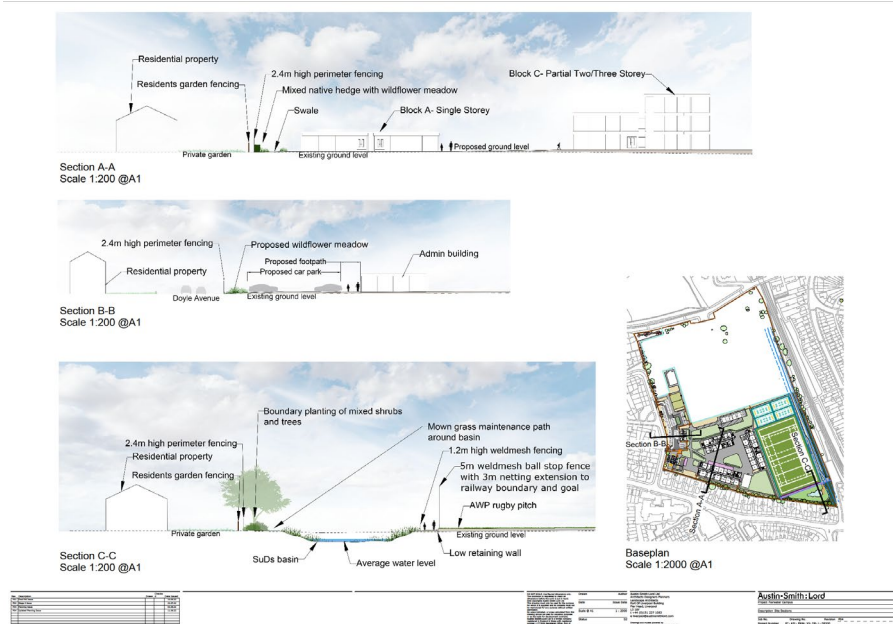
Section Plan through site showing the location of the temporary school in relation to adjoining boundaries
